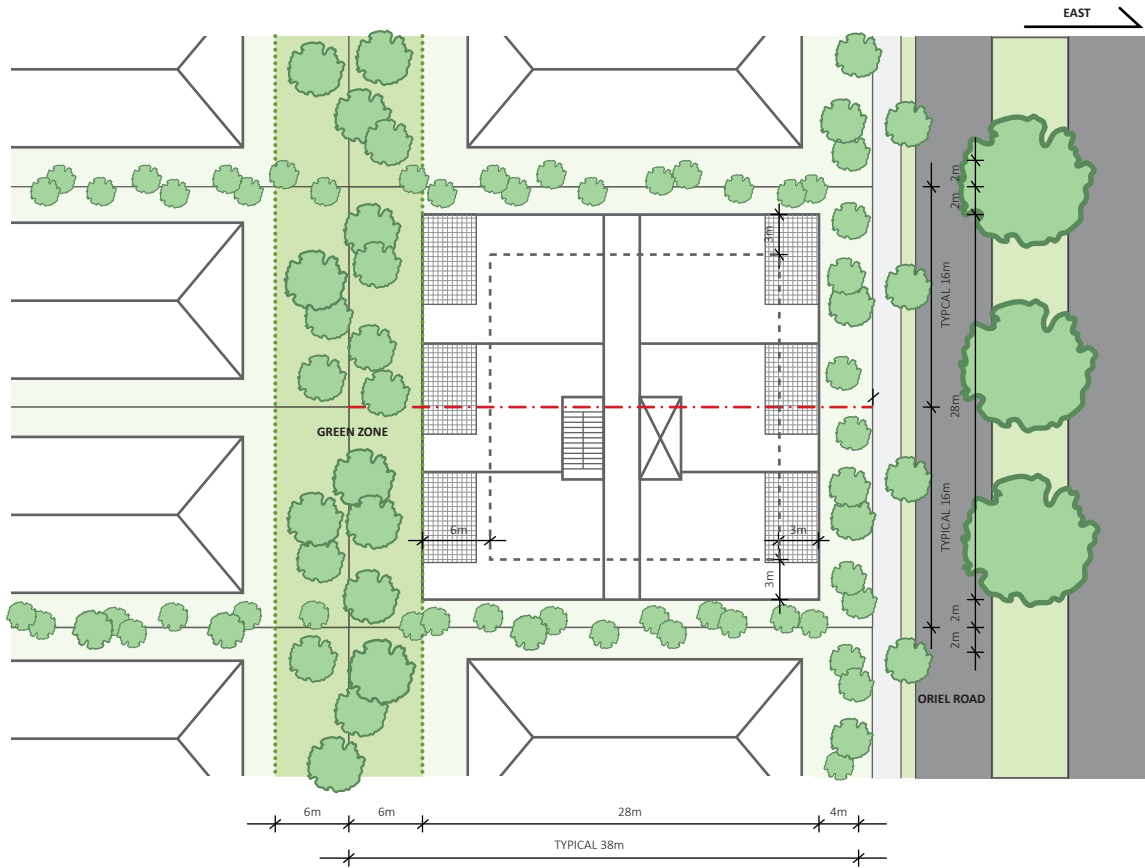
Typical Upper Floor Plan - Main Roads with two lots consolidated
